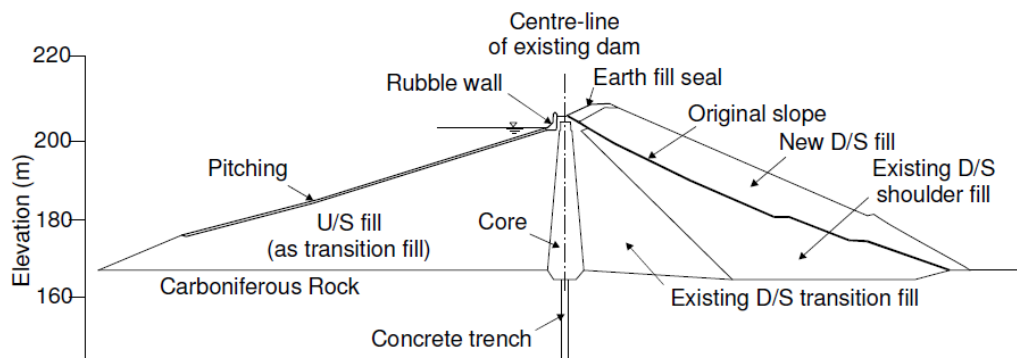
Typical cross-section of old and reconstructed Ladybower Dam (Kovacevic et al., 2008)
